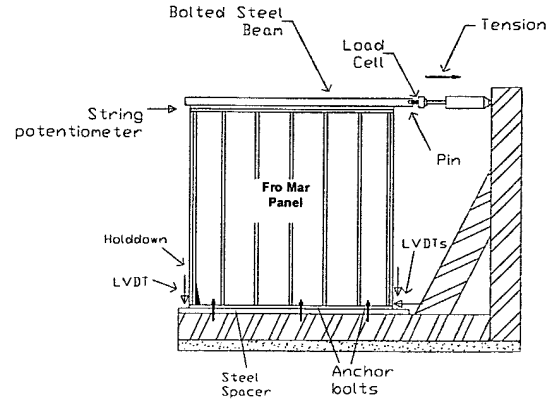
Typical Cyclic Shear Wall Test Set-Up
